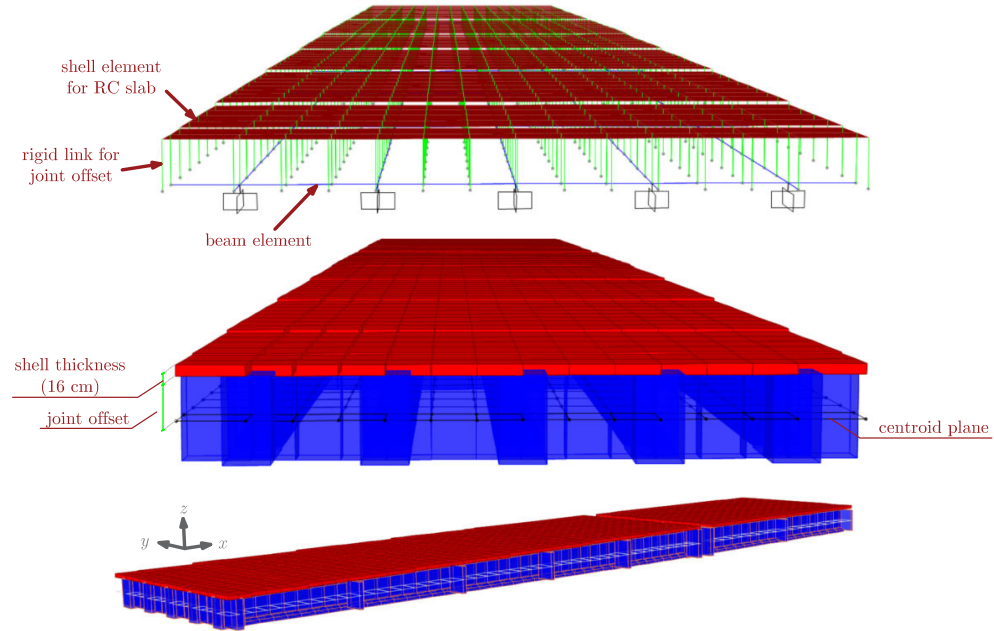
View of half of the FE model of the bridge deck modeled using shell elements with joint offset for RC slab and beam elements for longitudinal girders and transverse diaphragms: offset view (top) and extruded view (bottom).
